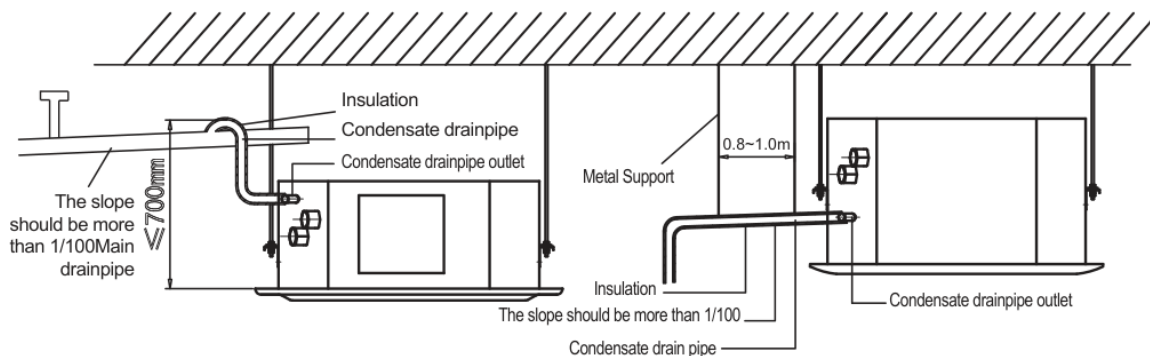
Condensate pipe with pump (left) and with gravity drainage (right)
